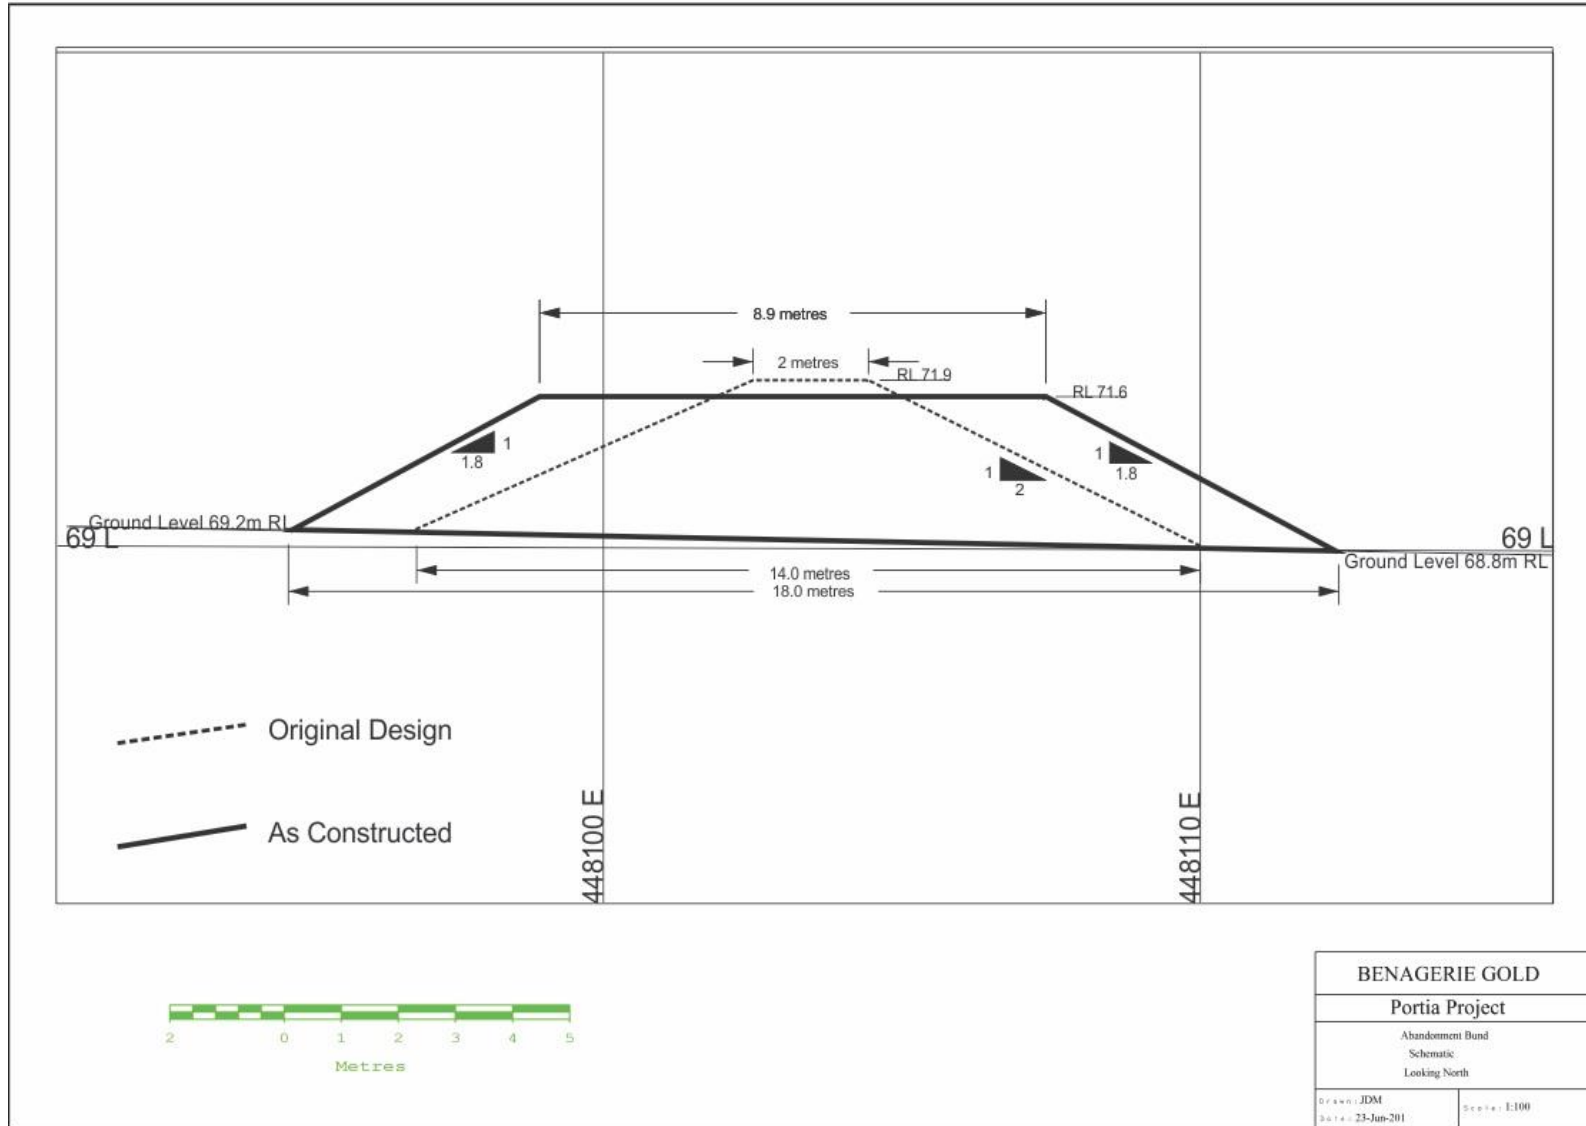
Schematic Cross-Section of the Pit Abandonment Bund at Closure
